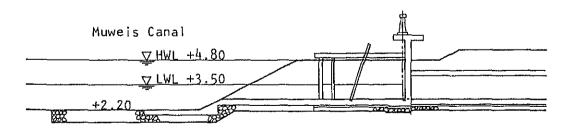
<u>INTAKE FACILITIES</u> (Kafr Saqr Plant)
